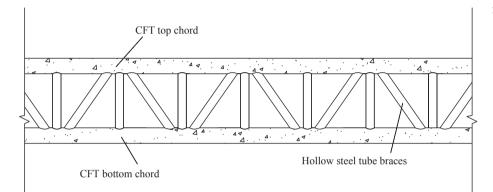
Typical CFT truss girders (Warren-vertical truss).
